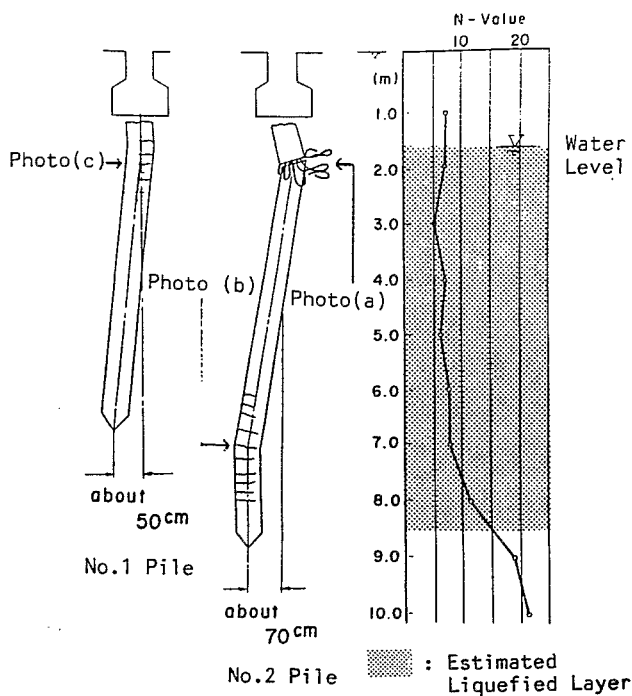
Damage to floating and end-bearing piles and Standard Penetration Test N-values, NFCH building, 1964 Niigata, Japan earthquake (Hamada, 1992a).
